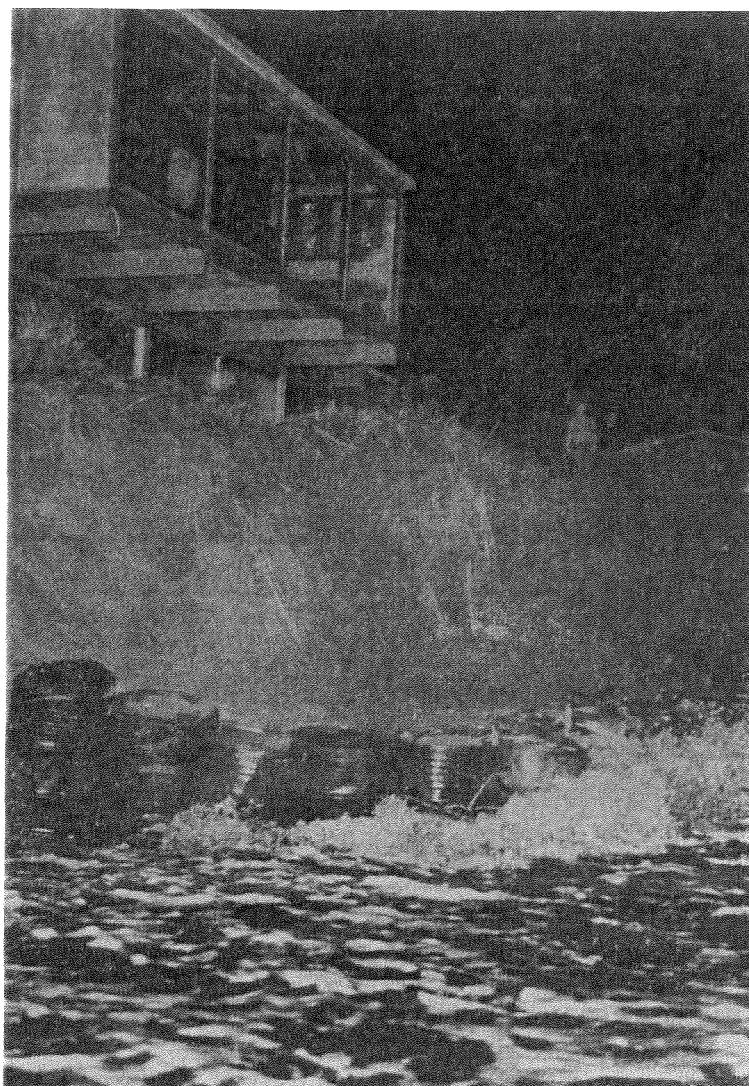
Protective Works at Torea Lane 1964 Storm
